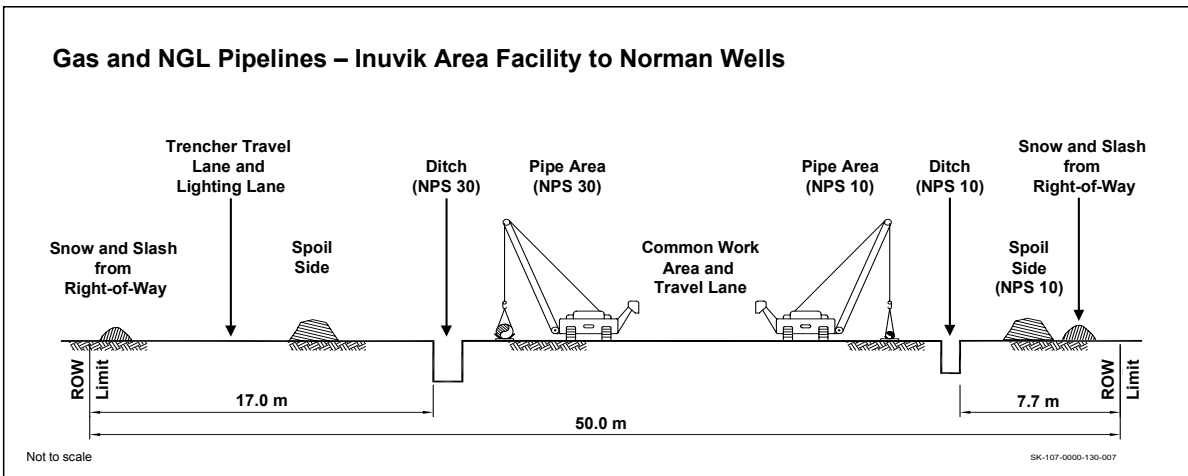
Typical Right-of-Way Layout for NPS 30 and 10 Pipe
